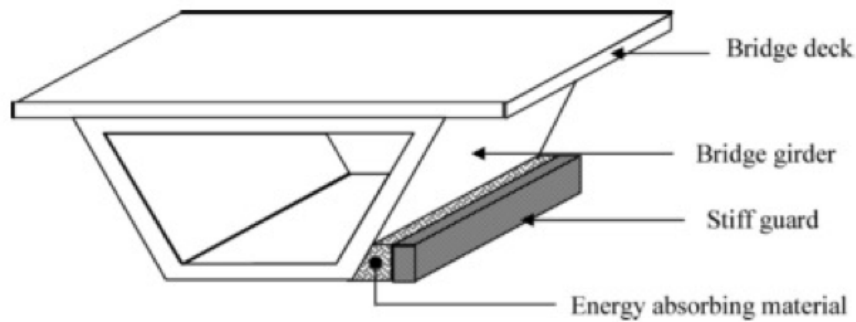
A crash beam designed for a bridge bumper installation on bridge girder (Sharma et al., 2008)
